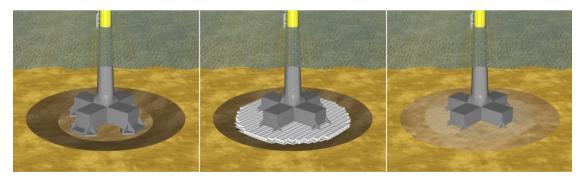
States of scour protection construction (from left to right): state after settling the foundation into the prepared pit; state after installation of the scour protection system in the pit; final state with backfilled pit (Wahrmund et al. 2011).
